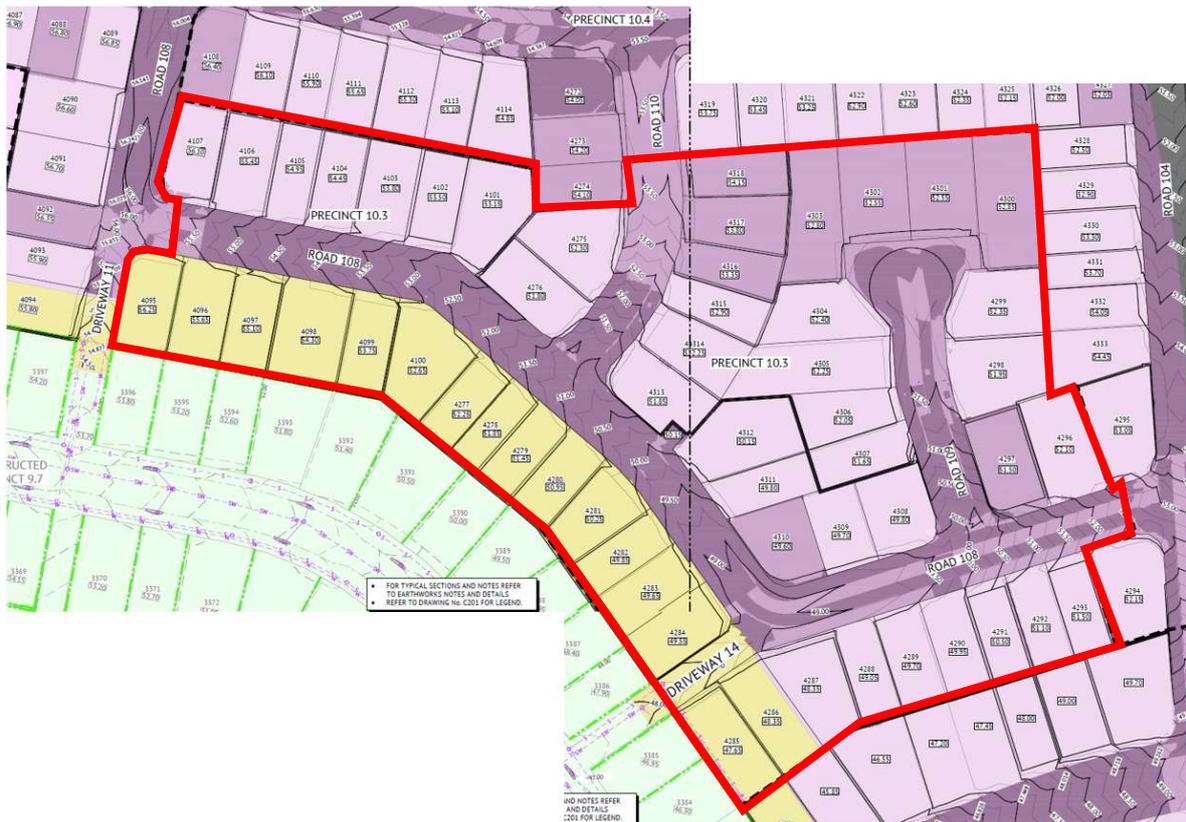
Actual Constructed Area of Fill (600mm BFSL) – Shadforth Survey Plans
